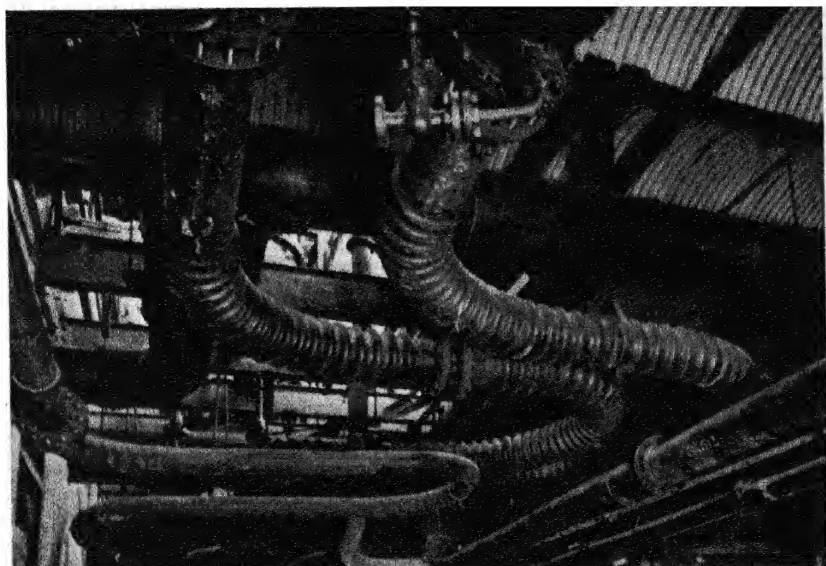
View of corrugated bends in steam pipework with Corwel Joints
